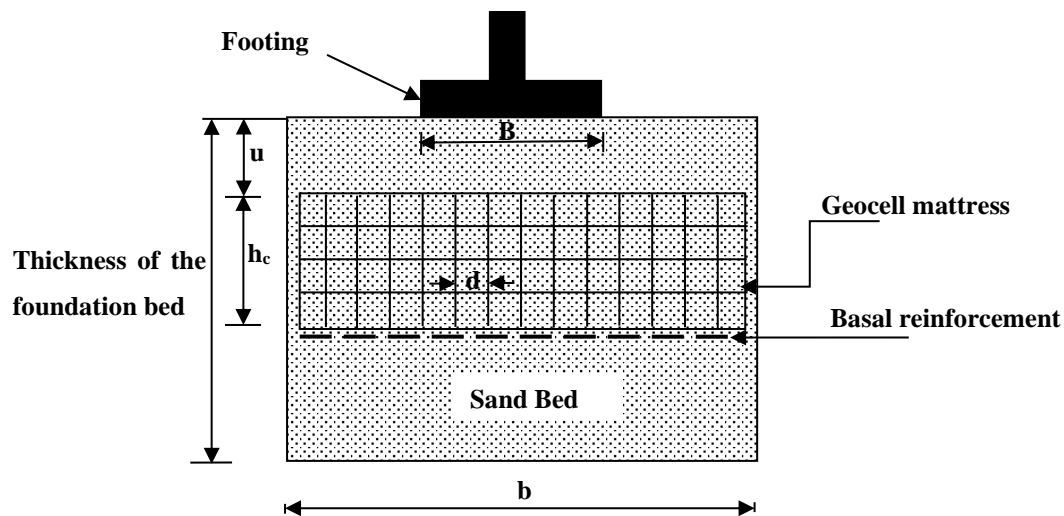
Schematic view of strip footing supported by geocell reinforced foundation bed (After Dash et al. 2001a)
